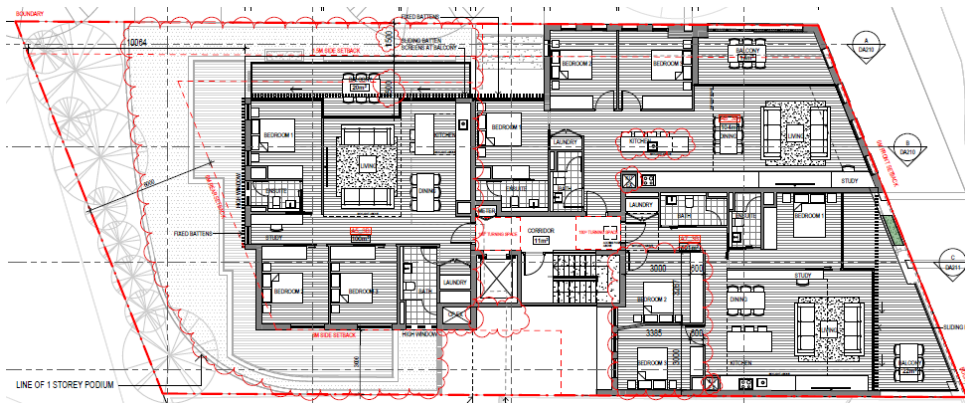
First revision of level 3 floor plan under the subject DA - 18-20A Perouse Road, Randwick
